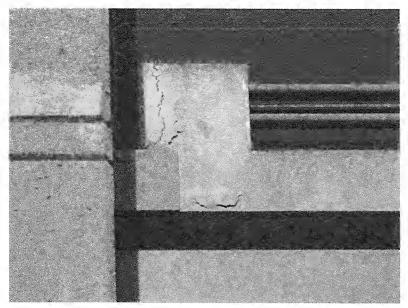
Incipient spalls on concrete balcony rail at east facade, tenth floor
